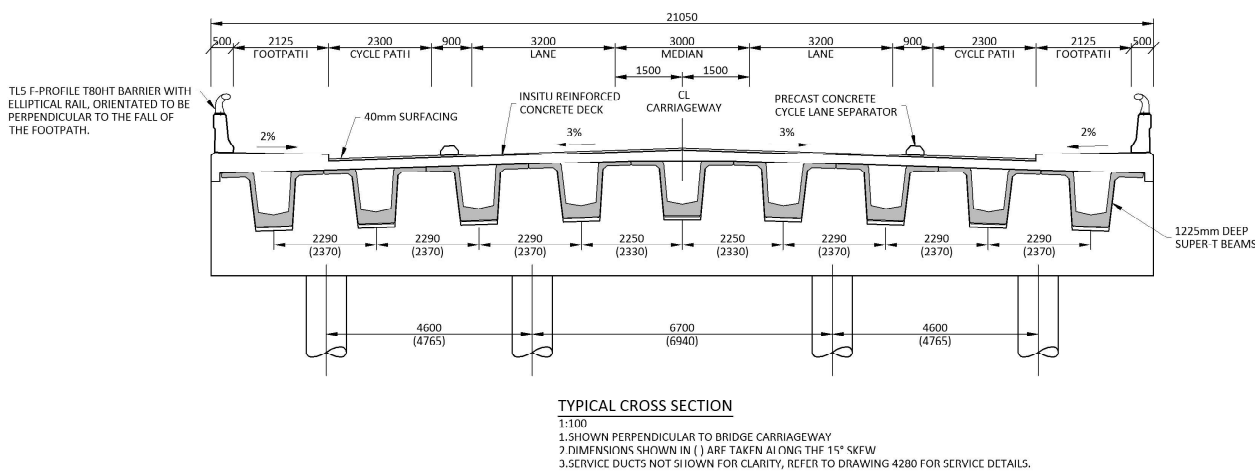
TYPICAL BRIDGE CROSS SECTION
